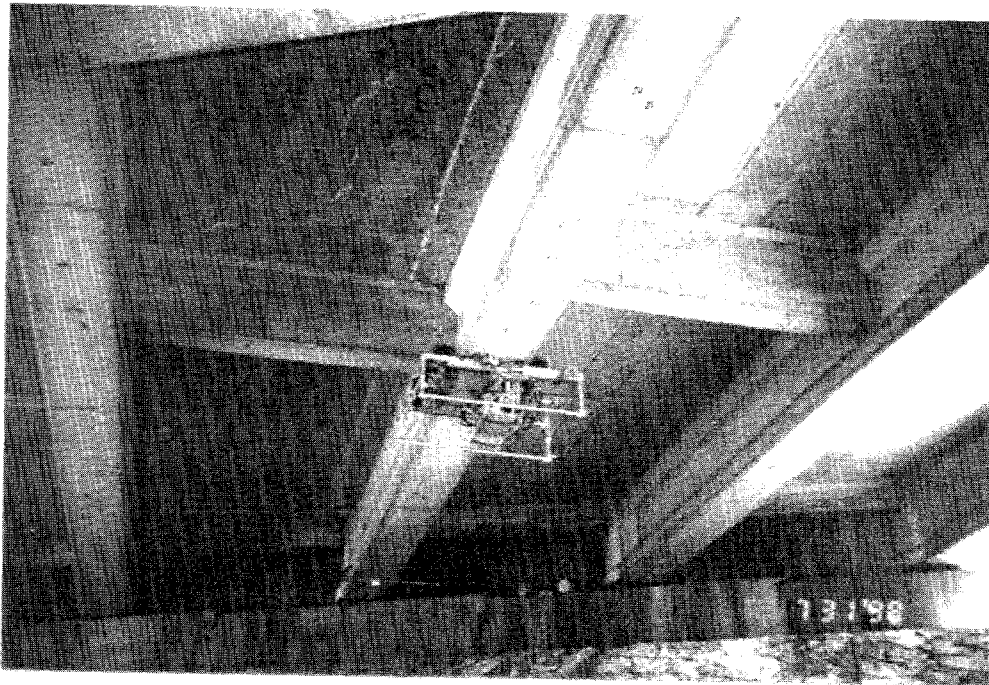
Overall layout of the structural framing of the bridge span tested by the MFL system.
